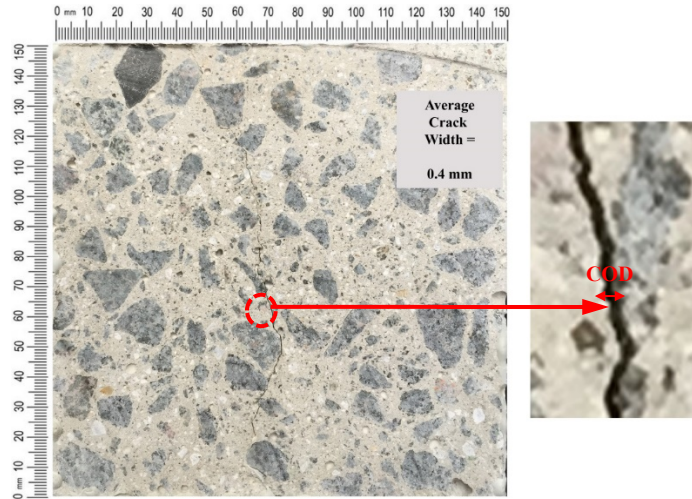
Typical crack formation in the concrete specimen and definition of crack opening displacement (COD).
